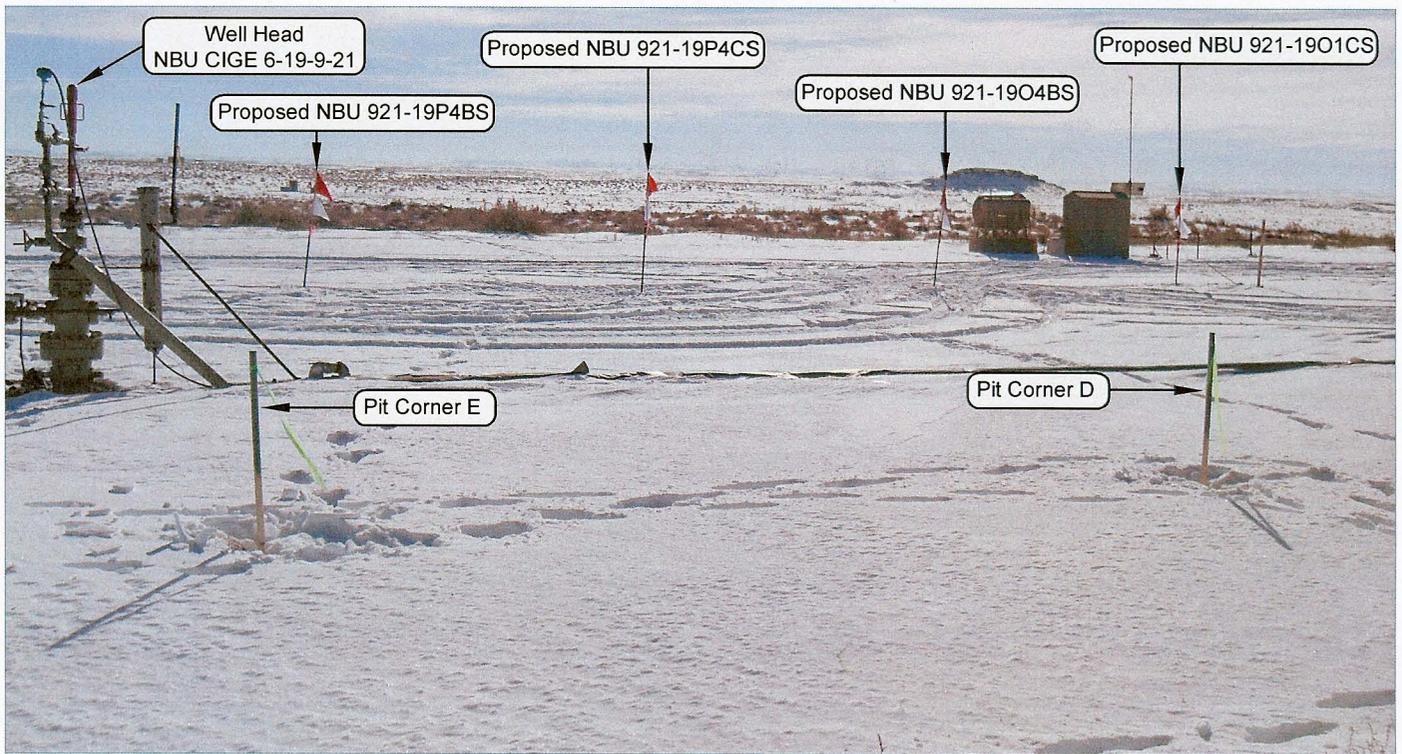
PHOTO VIEW: FROM PIT CORNER E TO LOCATION STAKES
